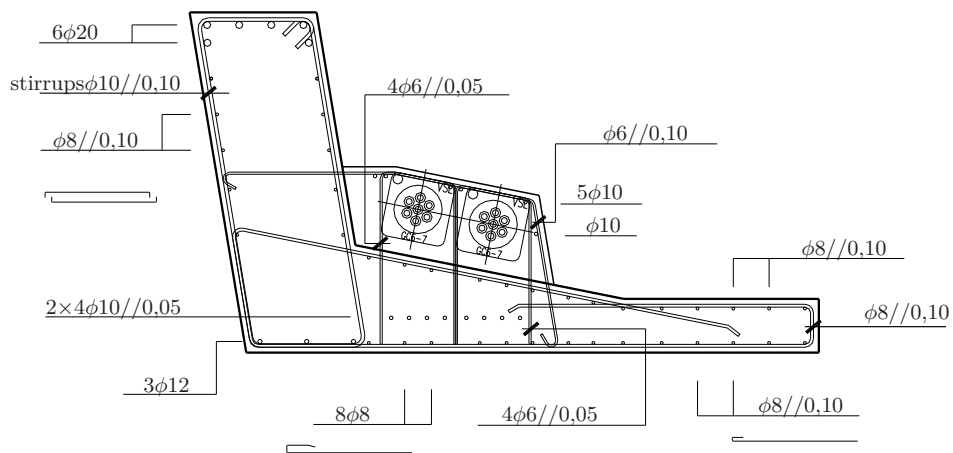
Reinforcement in the blister anchorage zone - Cross section
